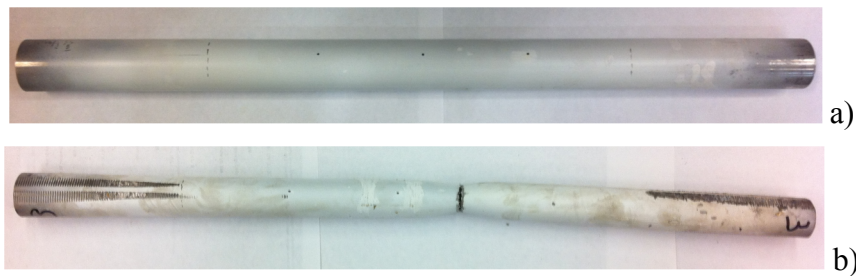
Specimen having a 1.25 in. diameter: a) prior to testing; b) after testing (failure)
